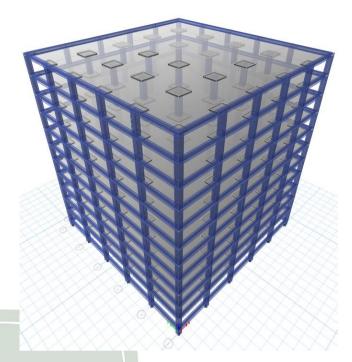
3D model of flat slab with edge beam & without shear wall.
